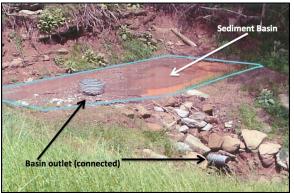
A sediment basin filled with sediment. Basins must be cleaned out before they reach this level of sedimentation (The Charleston Gazette, 2010) diameter be dug about 30 centimetres ahead of the pipe. The sides of the hole should be sloped very steeply (around 60-90 degrees). The hole should have an outlet channel leading to the pipe and an inlet channel that starts narrow and widens up to the diameter of the hole as it enters. The inlet channel should empty into the hole at a depth of about 30 centimetres and the outlet should begin at a depth of about 20 centimetres (Figure 25).
